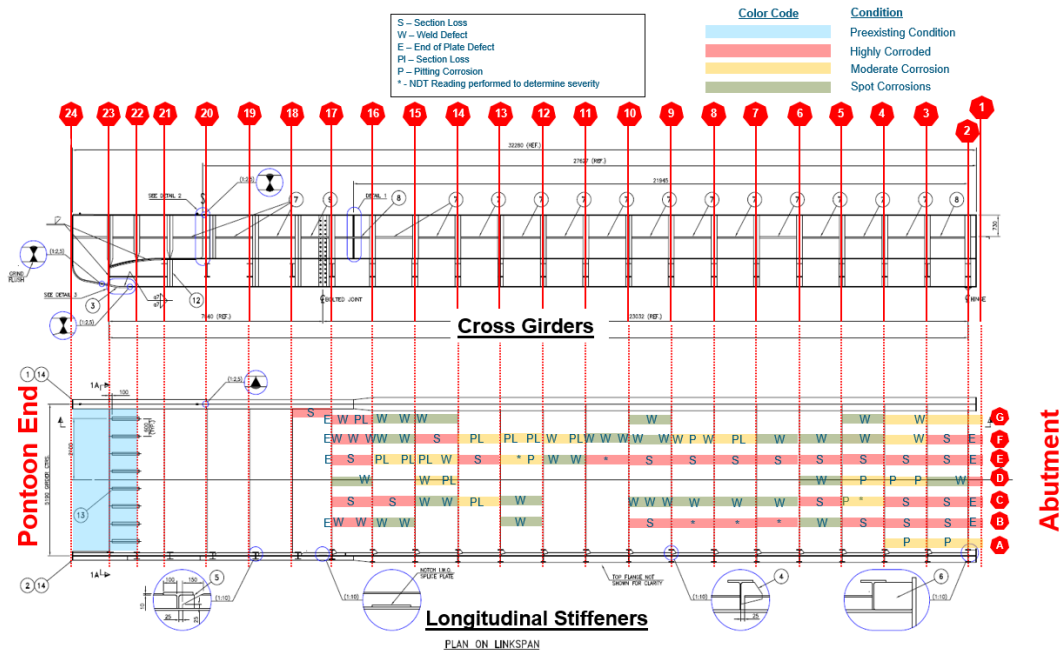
Dimensional Inspection of Longitudinal Stiffeners.
